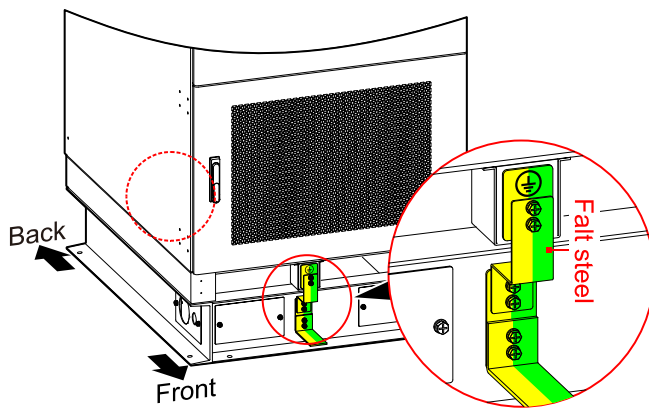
External grounding terminal connection diagram (U-steel installation)
